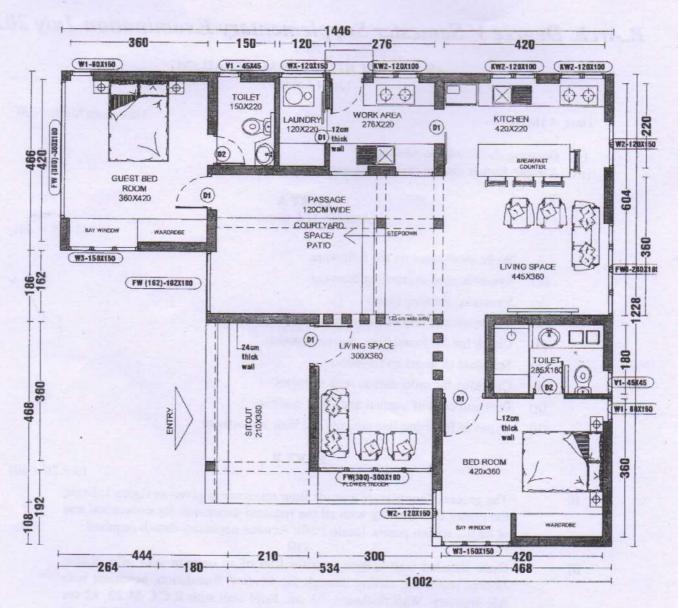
Ground Floor Plan. (Two brick wall thickness - 24 cm, 1 brick wall thickness - 12 cm)
